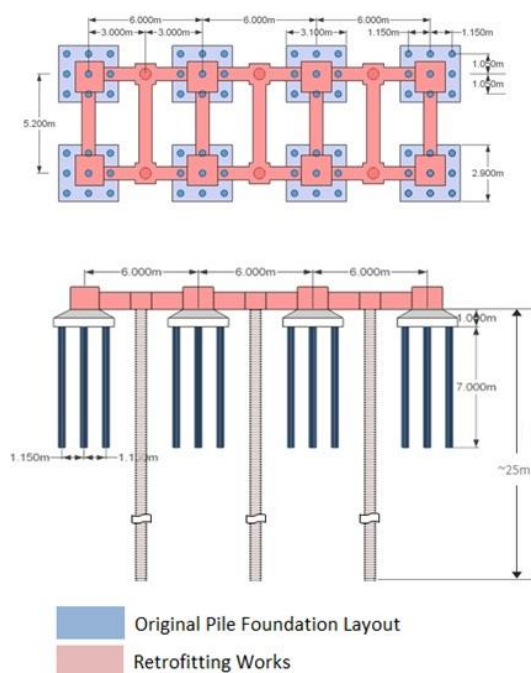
Plan and elevation of viaduct "A" [1]-[4]
